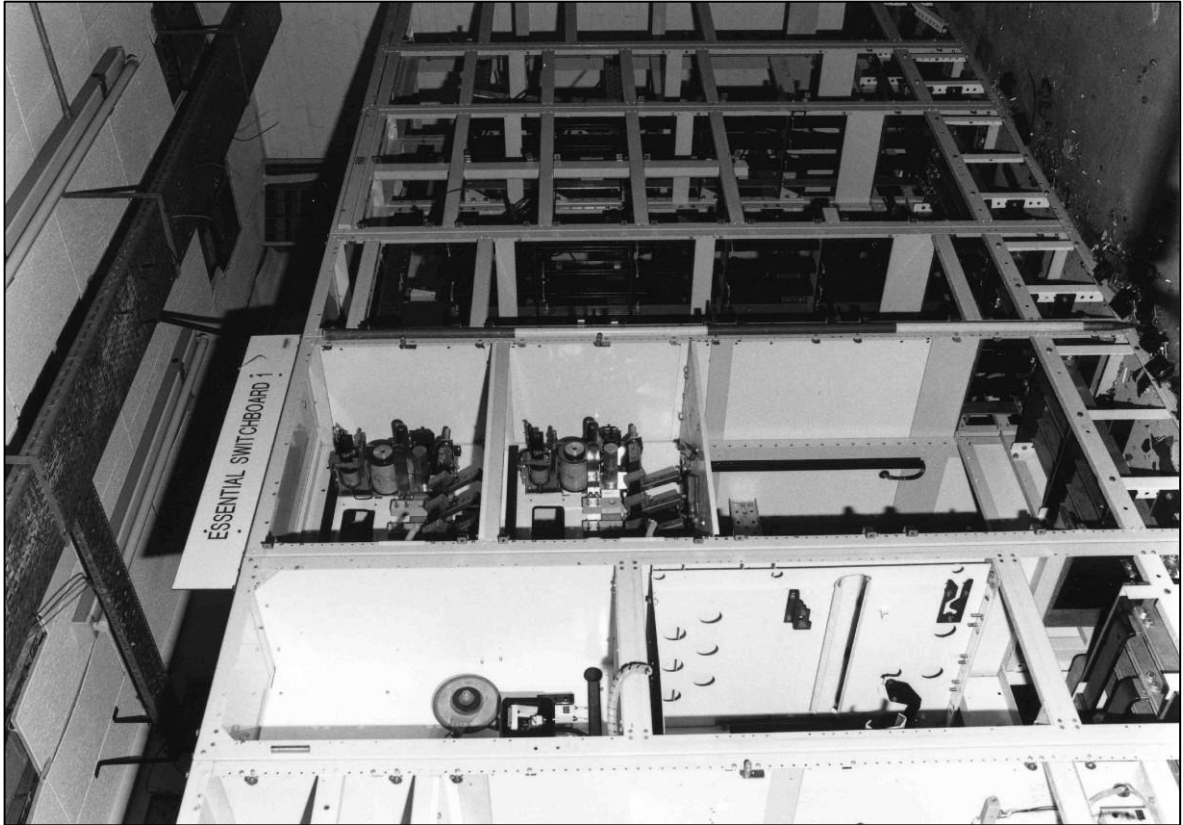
Essential Switchroom 1 (GF20), looking E (photo 5/15) (top to left).
